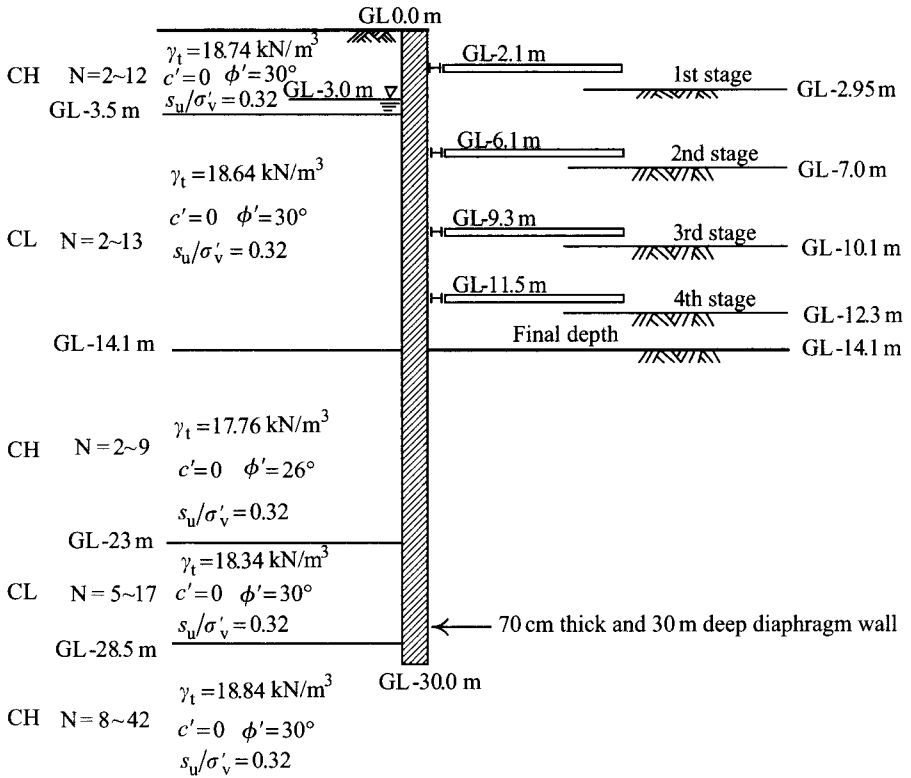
Soil and excavation profile of Building Q in Taipei.
